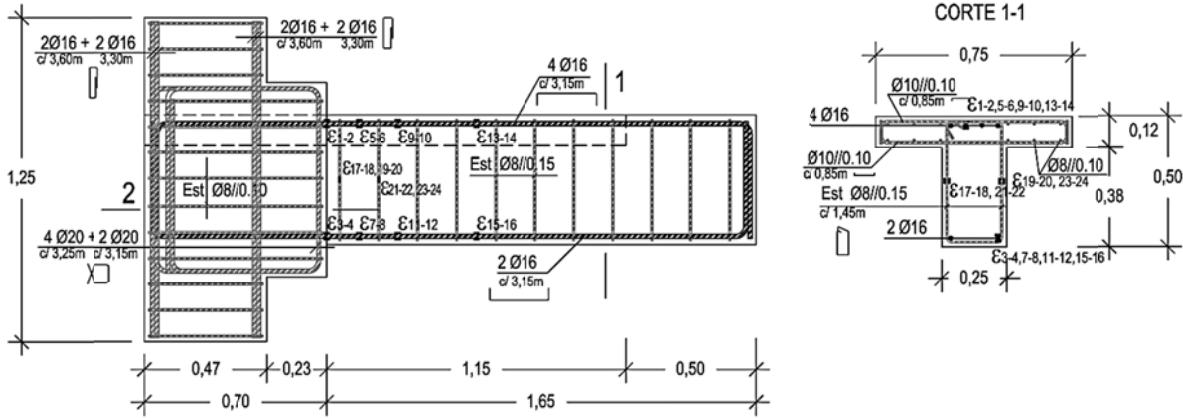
Geometry, detailing and internal instrumentation of the reference specimen (S1)
